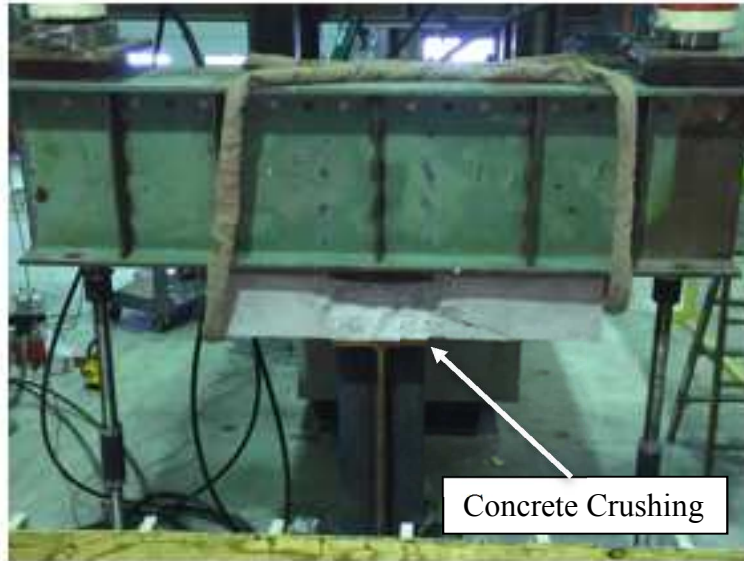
Localized Failure of Specimen II Under the Loading Point
